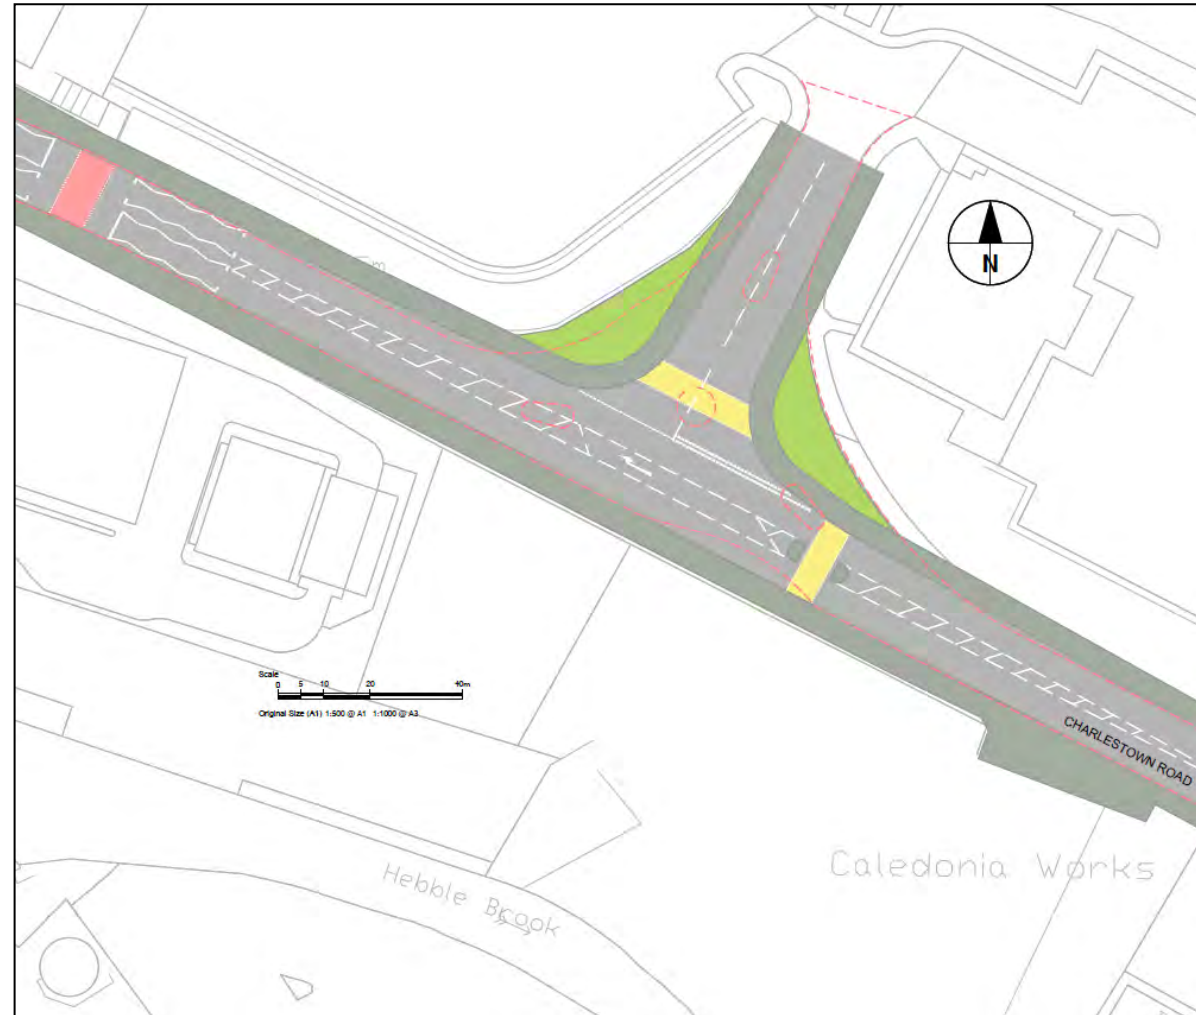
Charlestown Road Retail Park Access Preliminary Design
